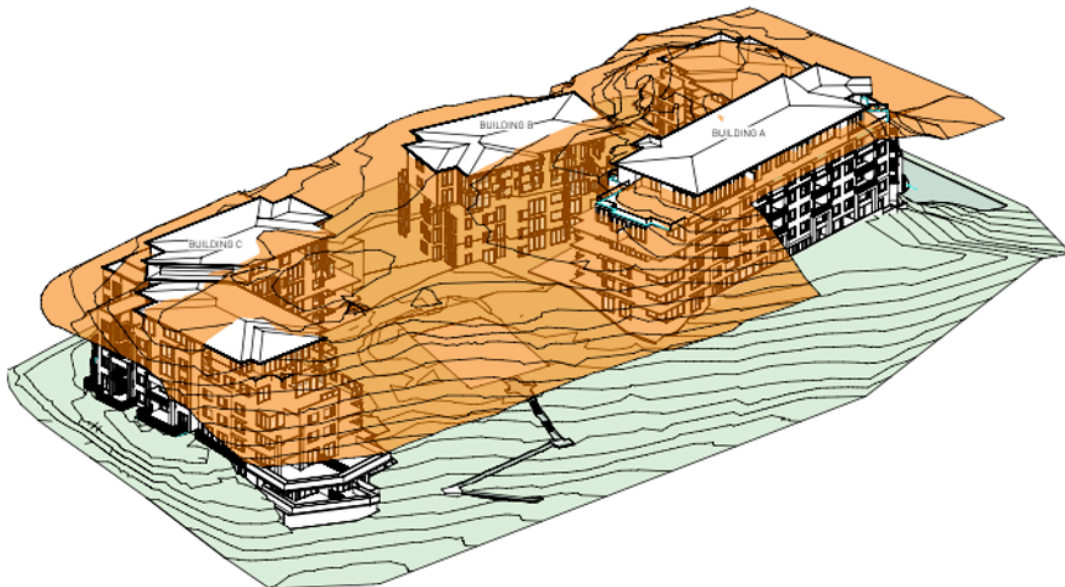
13m Height Plane Diagram – South East Elevation (extract from A 3.07 Rev E)
